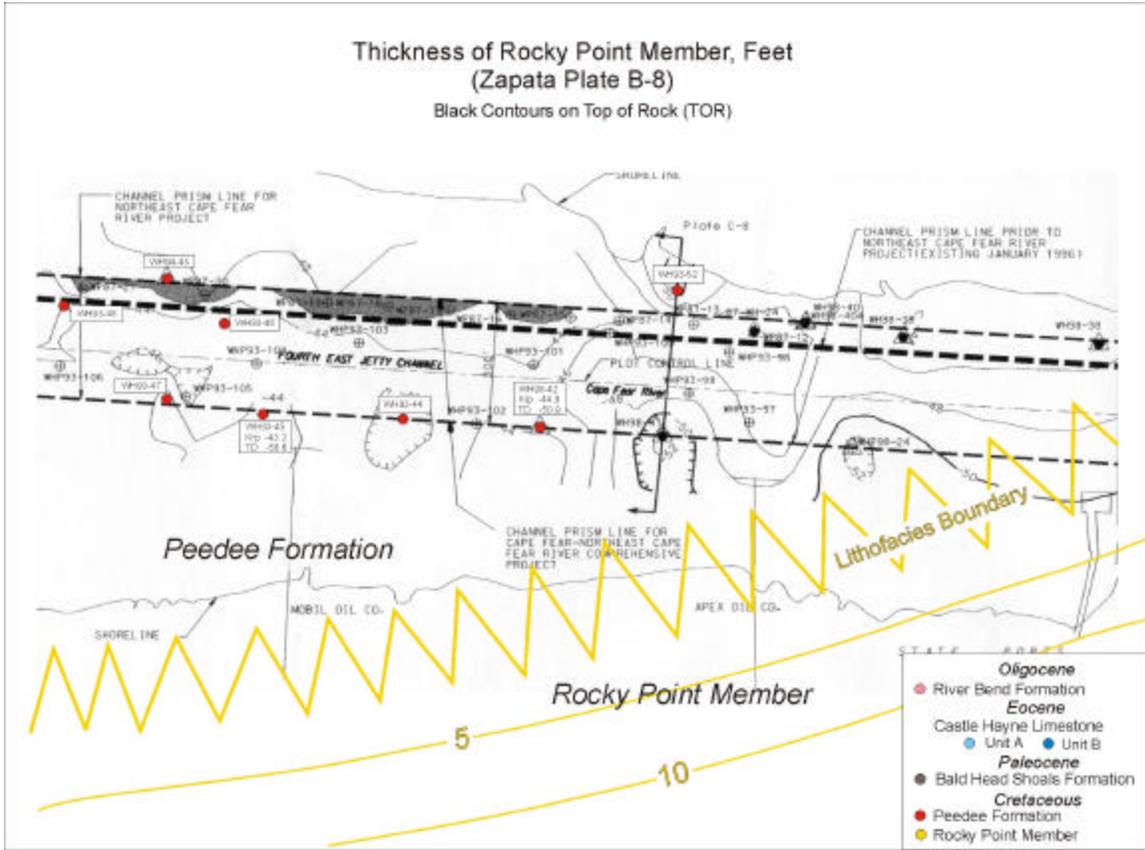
Thickness of Rocky Point Member, Feet, Zapata Plate B-8.
